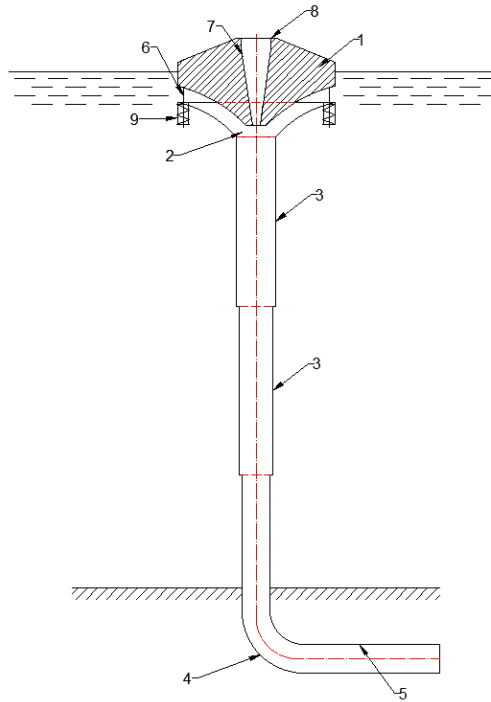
Vertical telescopic water intake: 1- floatation pontoon, 2- inlet funnel, 3- telescopically connected pipes (tapering downward), 4- elbow, 5- discharge pipe, 6- connecting elements, 7- air supply conical tube, 8- protrusions, 9- springs.
